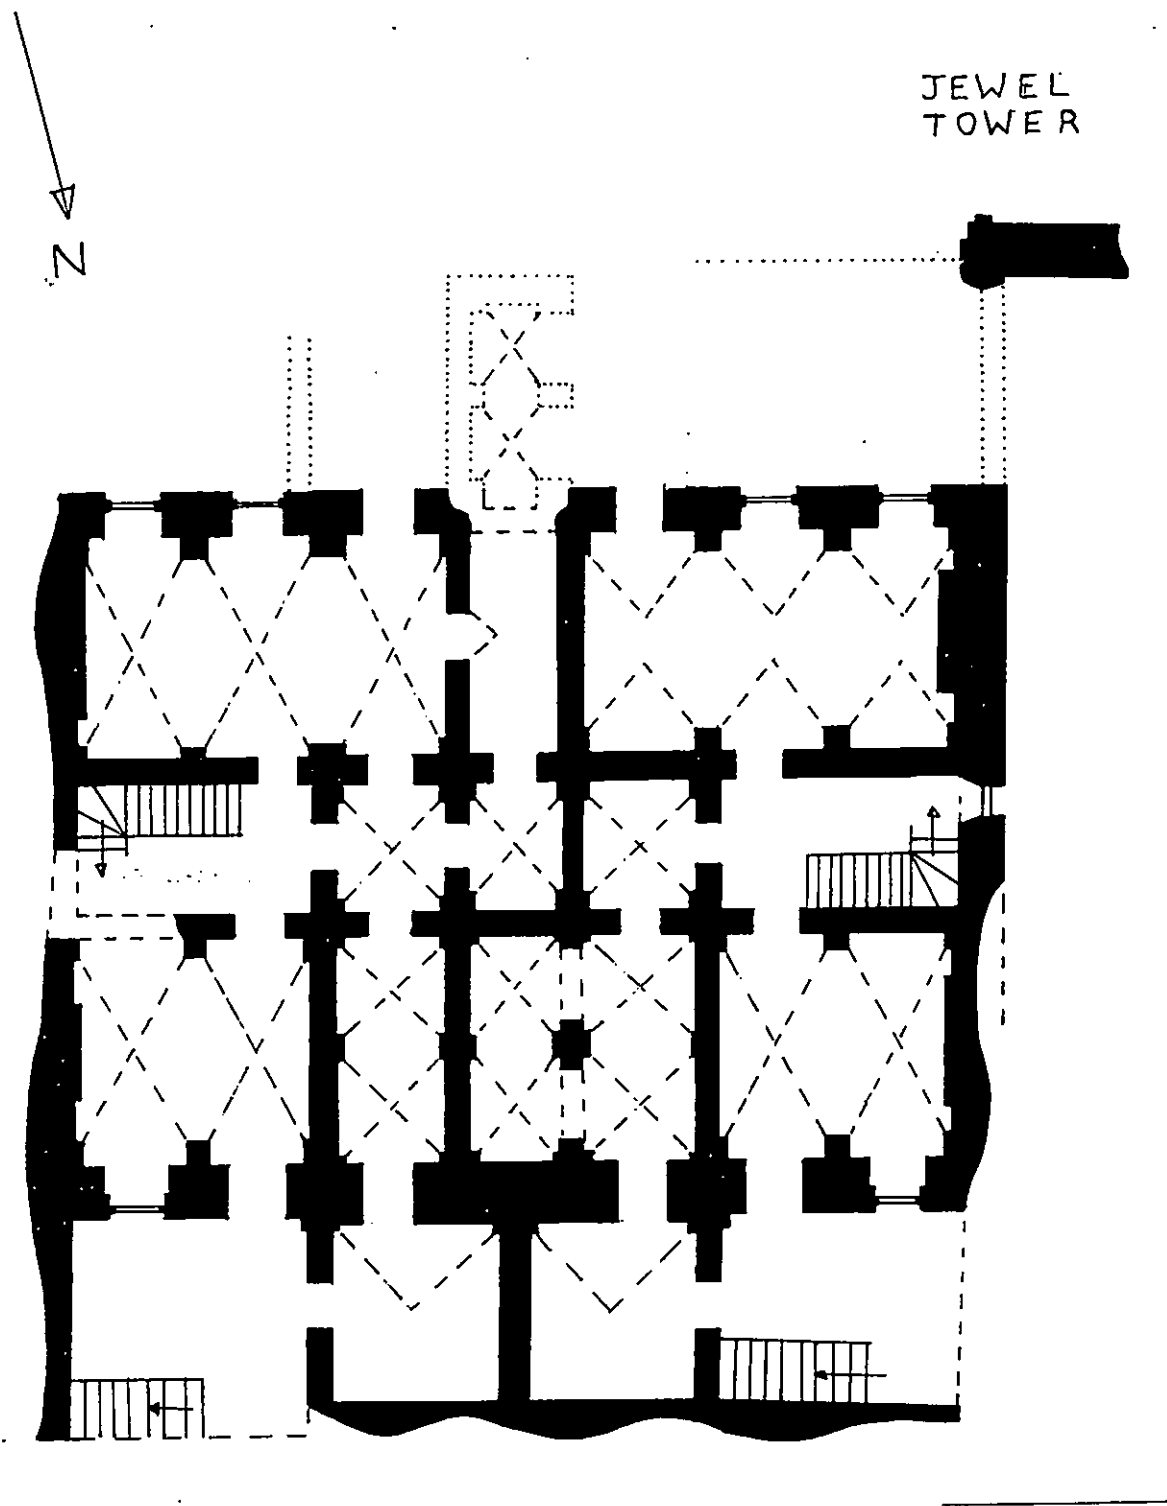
Conjectural reconstruction of the basement plan in 1756. Not to scale. (RCHME)
